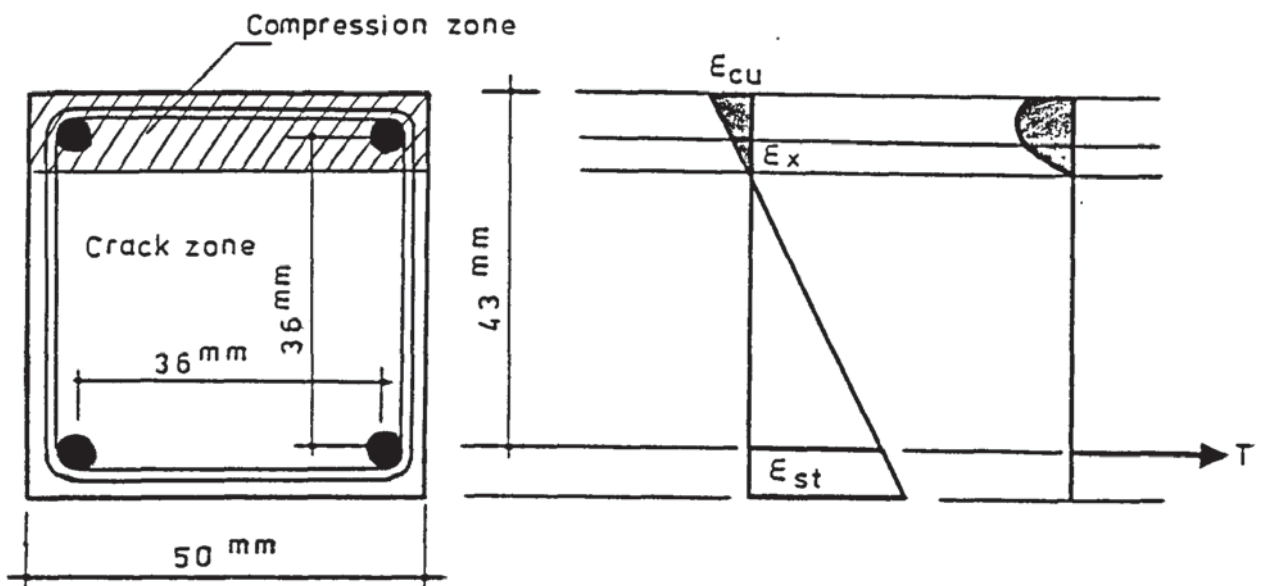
A TYPICAL REINFORCED CONCRETE
